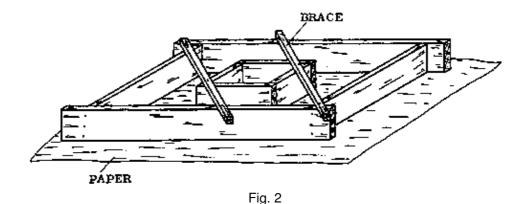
shows an example of the formwork for a slab with an opening in it.
